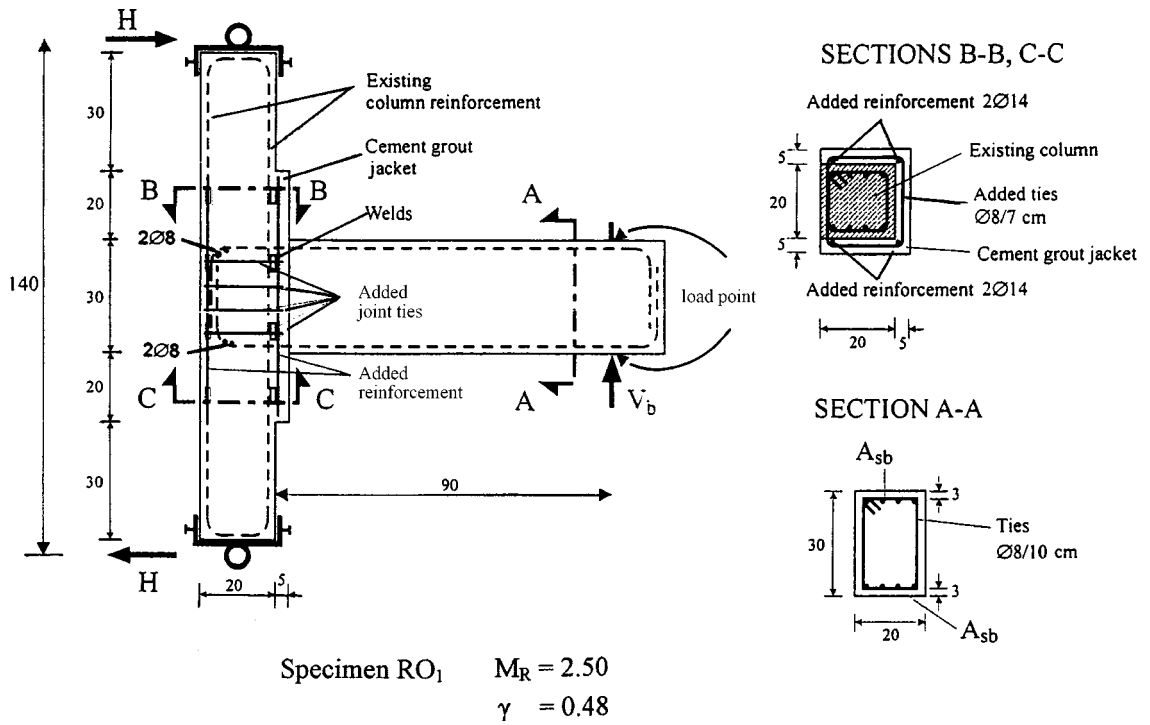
Jacketing of beam-column connection of subassemblage RO₁ (dimensions in cm)
